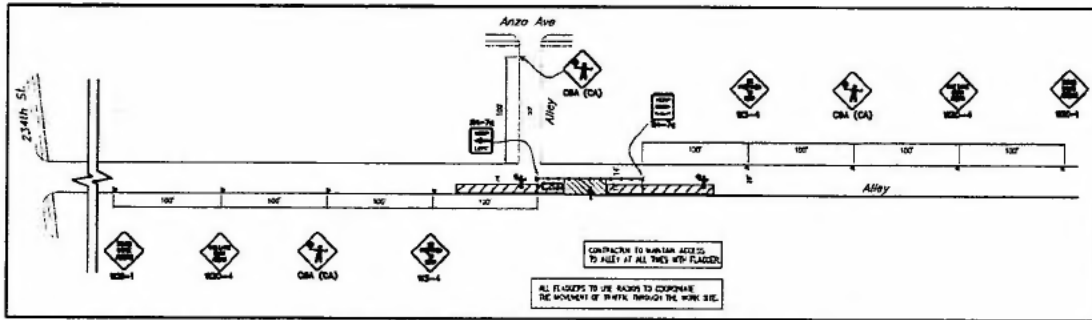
Proposed Work Area; additional Work Area for new strand and power fiber (hatched in red) (Source: Plans TC-1, annotated by Dr. J. Kramer).
